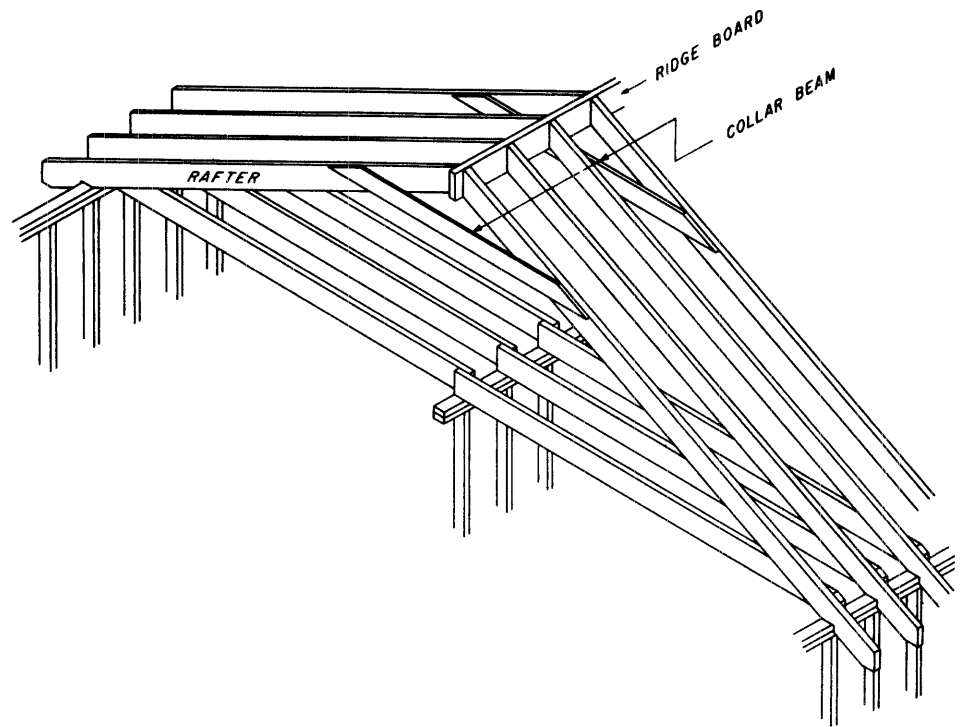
Roof framed with rafters and ceiling joists. (Courtesy of American Forest and Paper Association)
